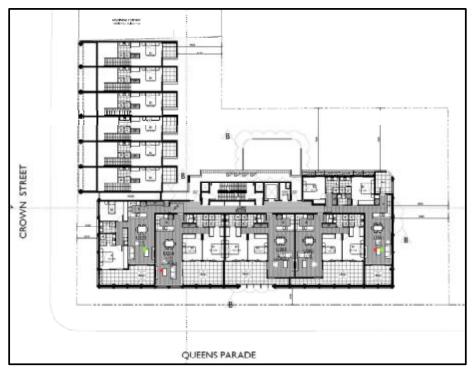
Typical Level 1 Floor Plan (\*Source: ADM Architects)
